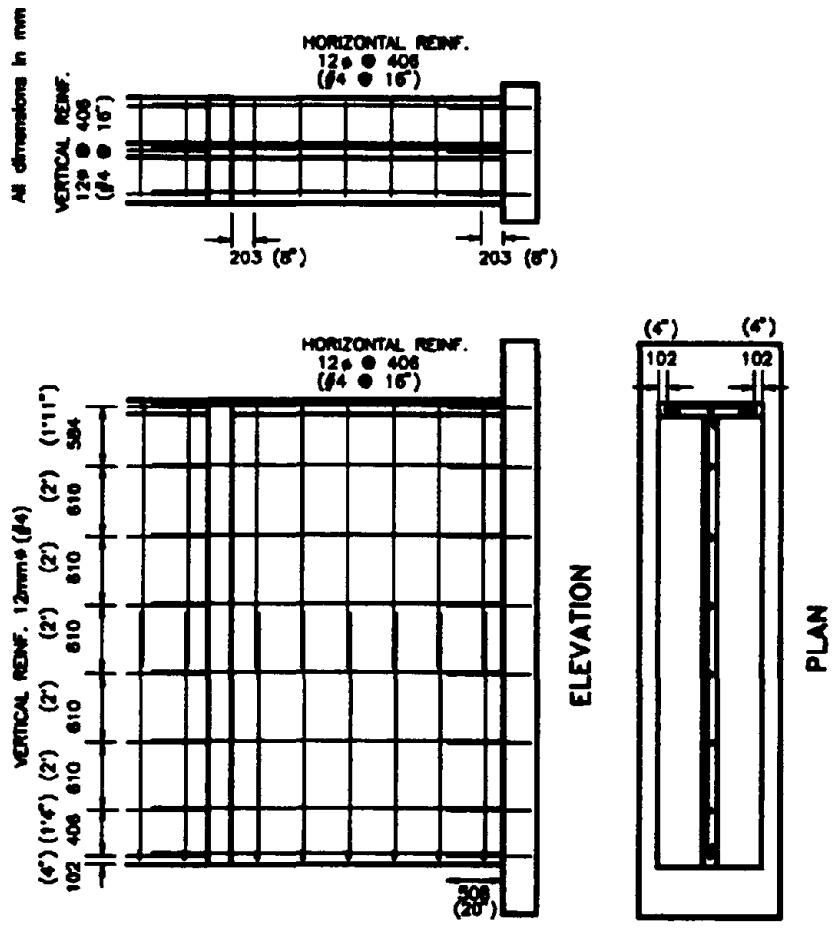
Typical Wall Panel Reinforcement Detail
